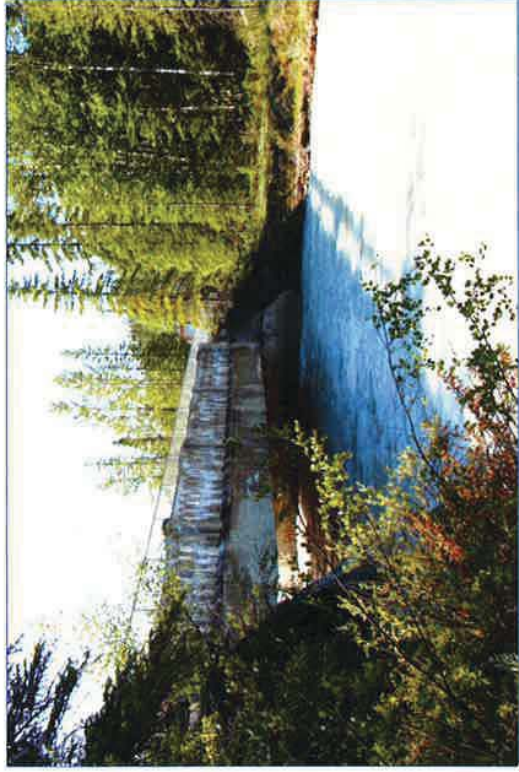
Bridge Crossing on Kicking Horse River, Facing Northeast over East side of Bridge along East channel.
